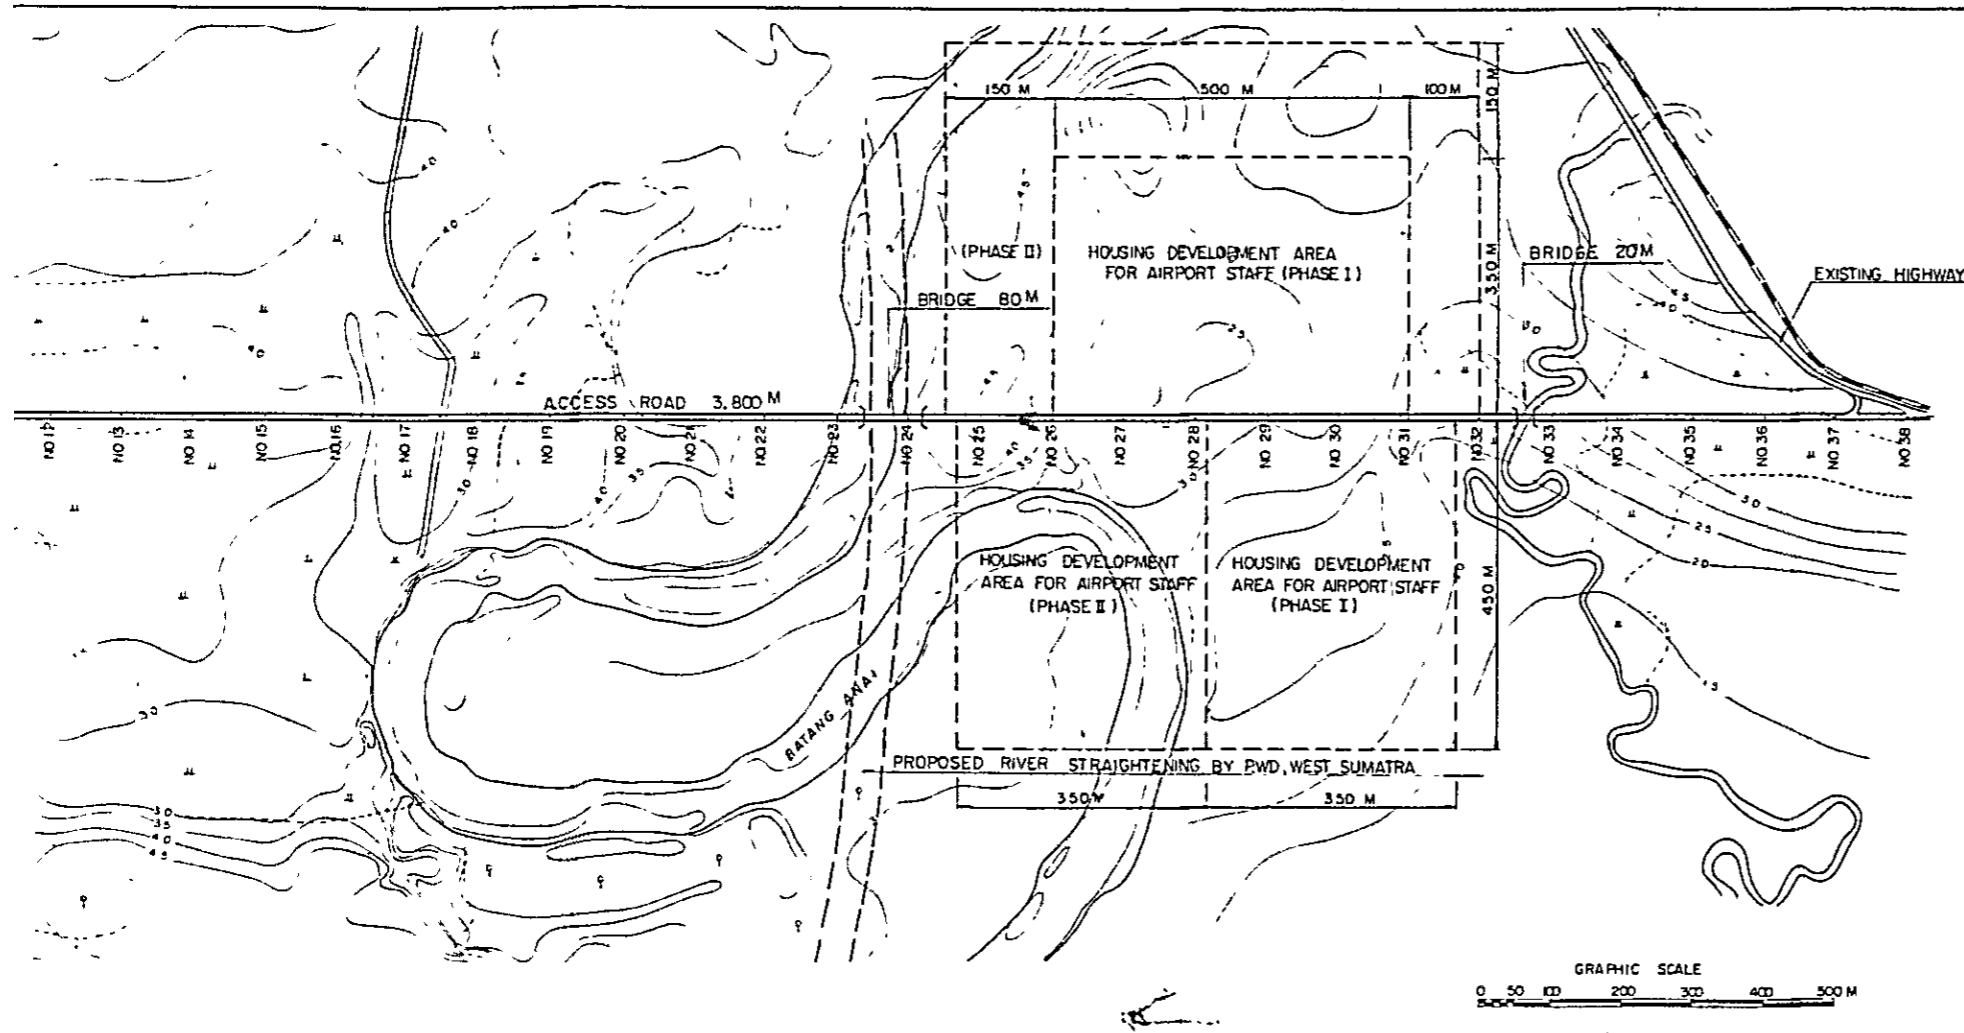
PLAN OF ACCESS ROAD AND HOUSING AREA FOR AIRPORT EMPLOYEES
